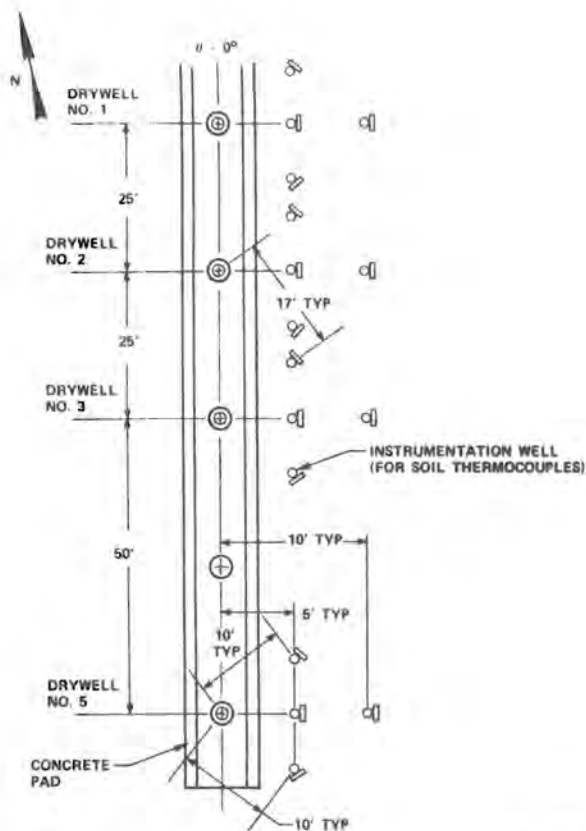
Drywell and Soil Instrumentation Well Arrangement
